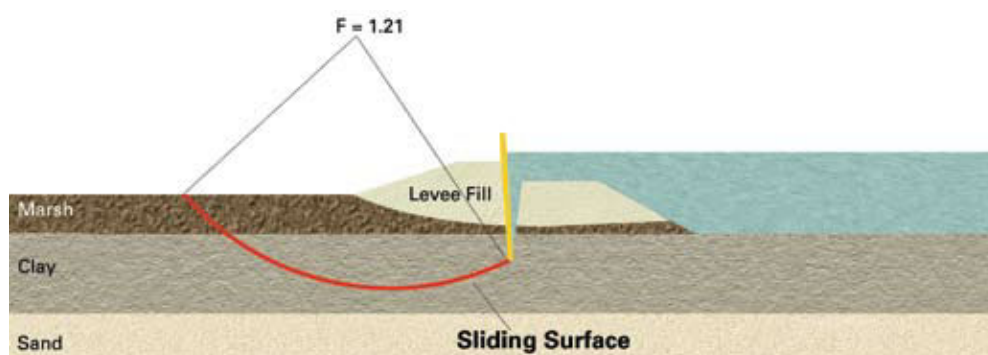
(#) illustrates the reason the water-filled gap led to failure of several I-walls. The first diagram in [Figure 7.4](#) shows the critical sliding surface passing beneath the 17th Street Canal I-wall and through soil between the wall and the canal—without a water-filled gap. The shearing resistance provided by this segment along the failure surface adds to the stability. In the second diagram of [Figure 7.4](#), representing the actual situation with a gap, the critical sliding surface starts at the base of the water-filled gap. The sliding surface cuts through less soil, so that less resisting soil strength can be mobilized. In addition, the pressure on the wall generated by the water in the gap adds to the forces tending to slide the wall away from the canal.
